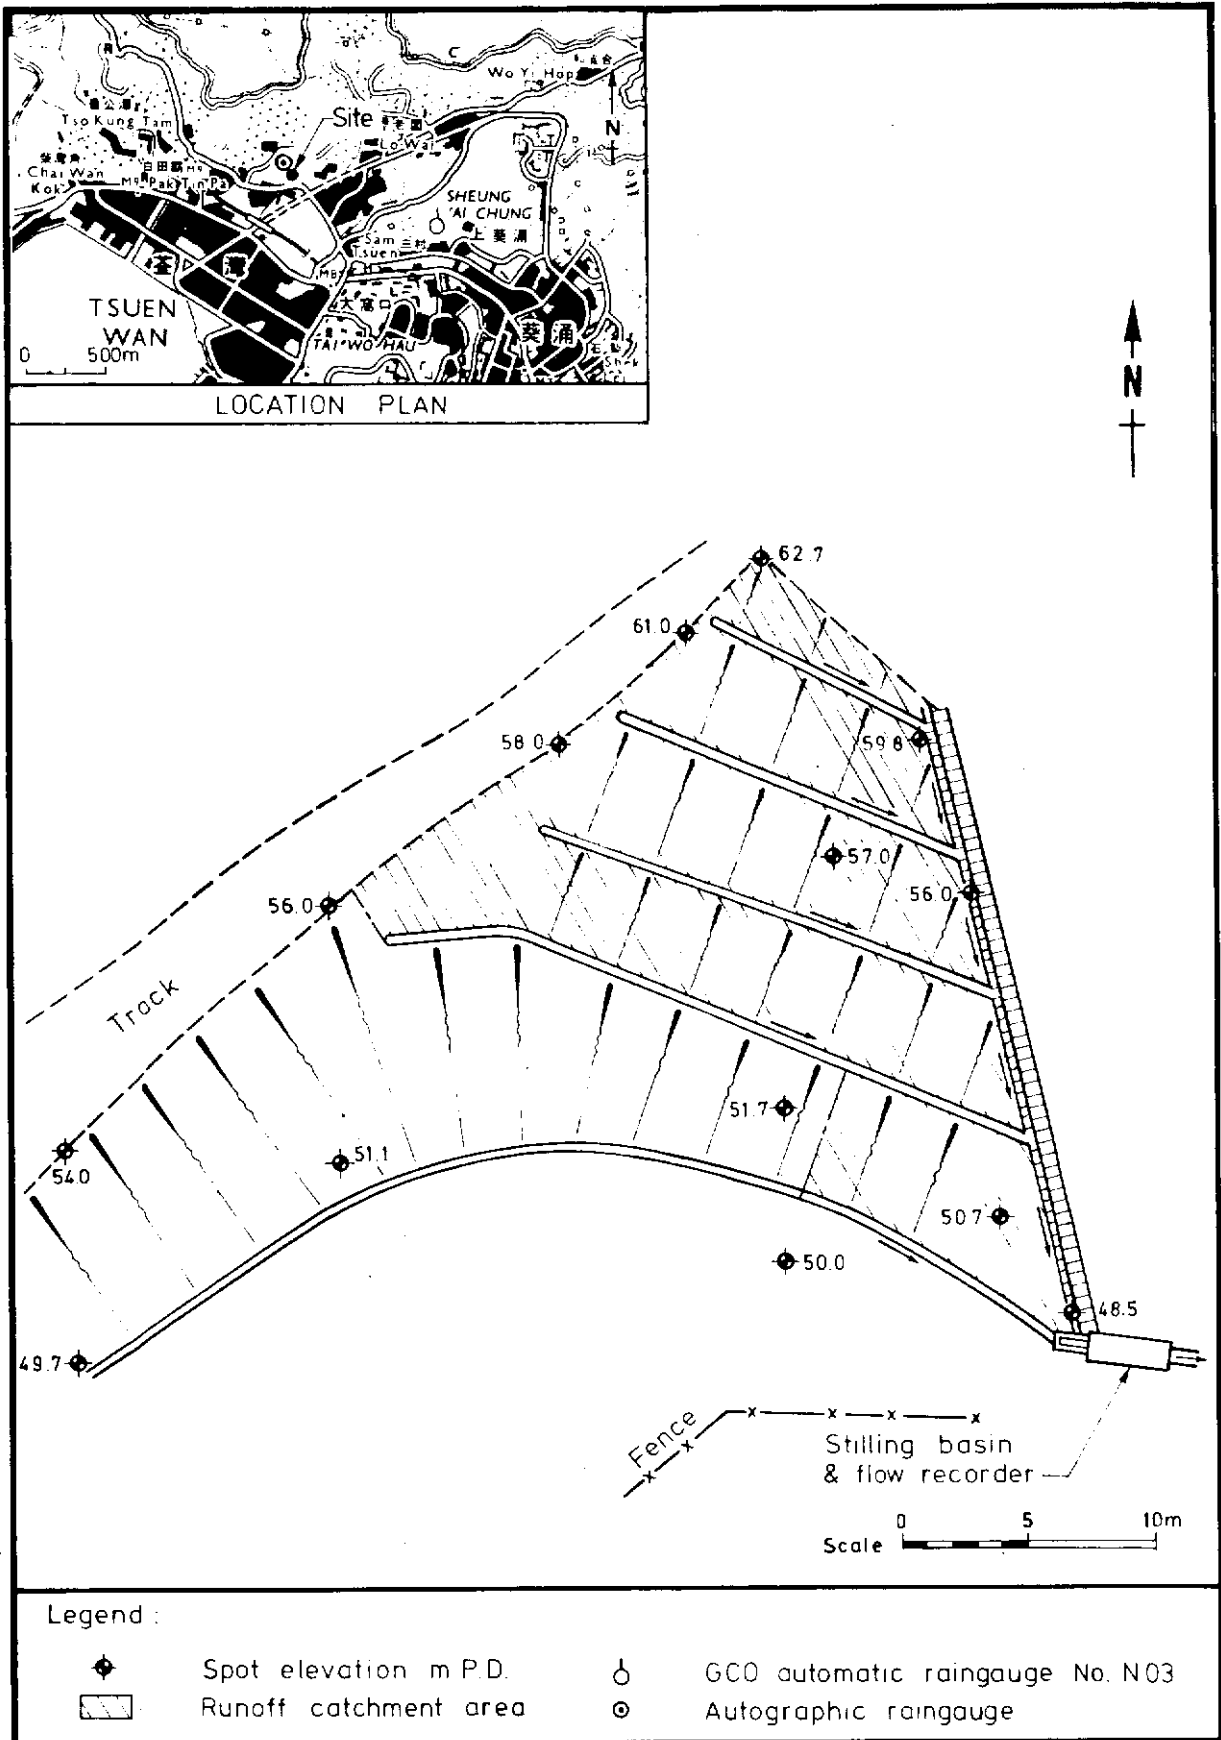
Site Plan for the Runoff Plot at Tsuen Wan (TWB)
